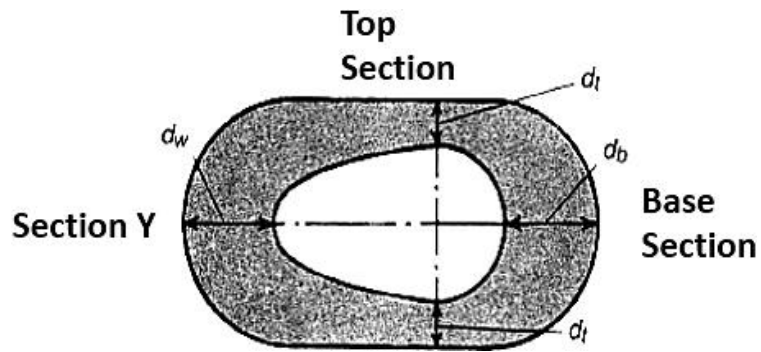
Y-joint reinforcement plane and disposition "Crotch plate" [15]
